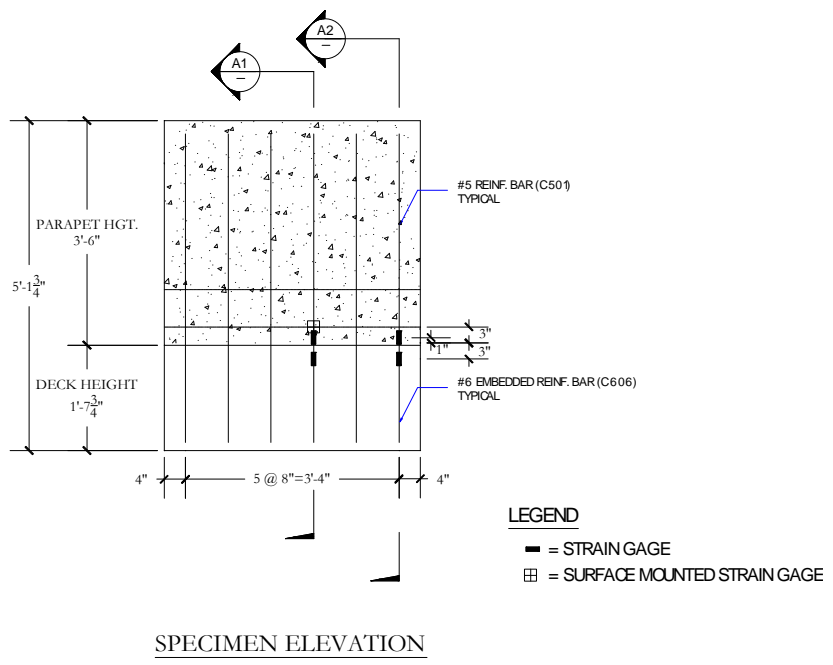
SECTION DRAWING OF PARAPET AND DECK GAGES
